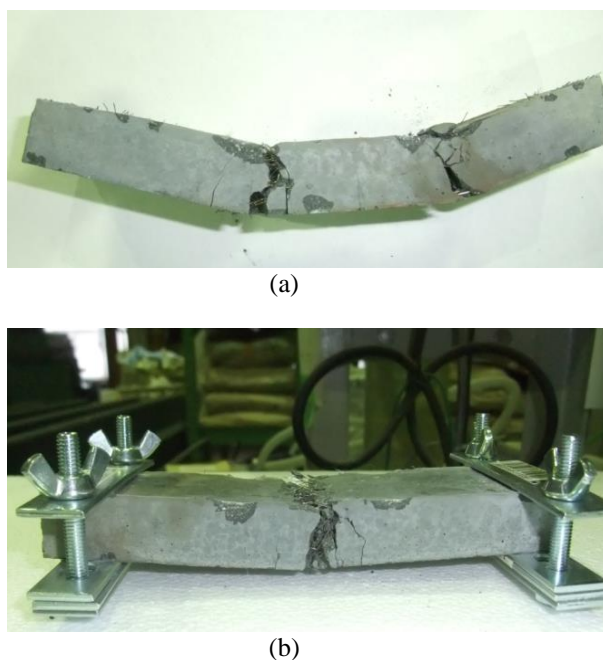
Deformed ECC specimen under (a) high load level (SL-1) and medium load level (SL-2)
